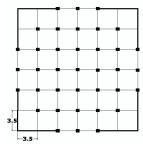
Building with soft storey with rectangular shape shear walls - Model 2
